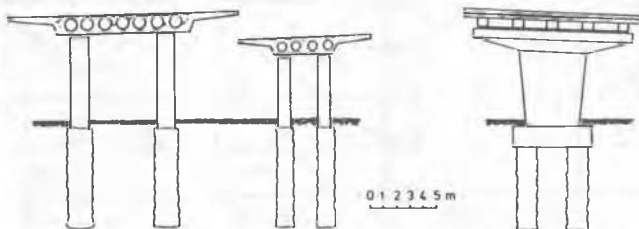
Typical bridge piers founded on a single file of large diameter bored piles
